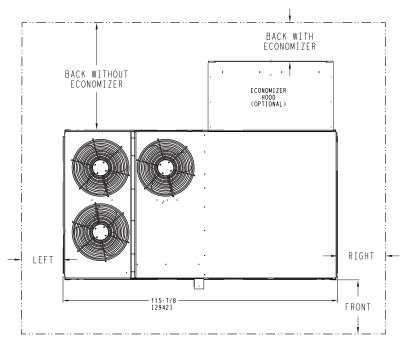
48GC\*\*14 Unit Dimensional Drawing
